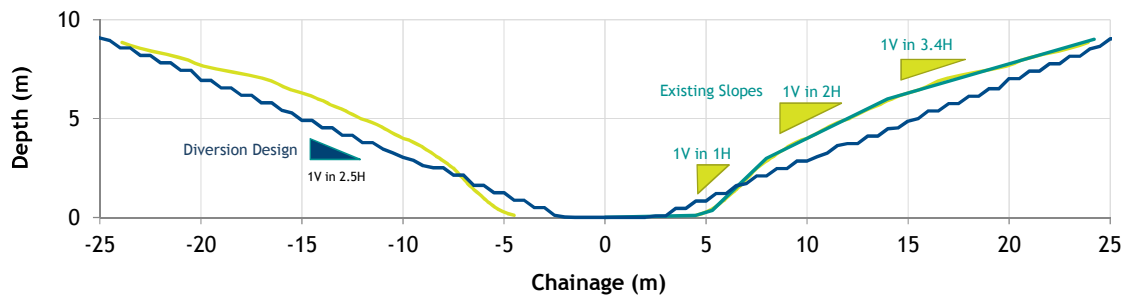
Typical channel cross-sections - existing channel and proposed diversion
